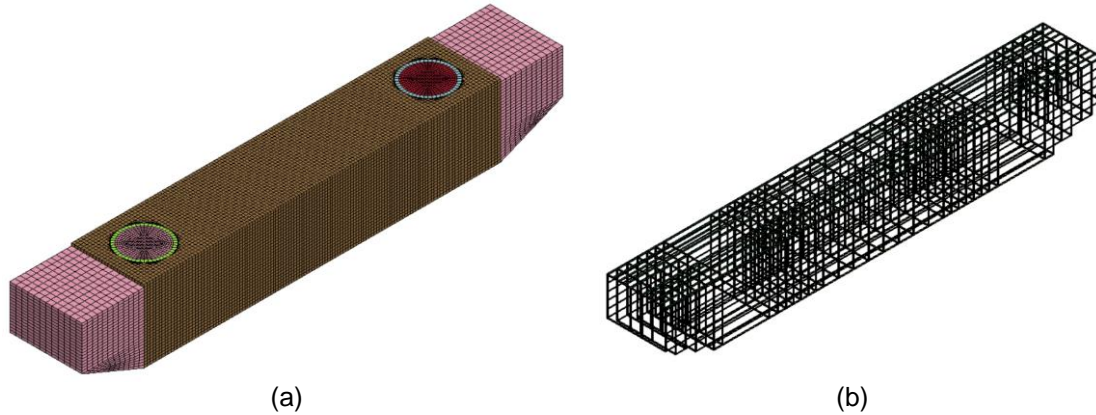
Details of the frame pier's bent cap: (a) concrete and (b) steel reinforcement
